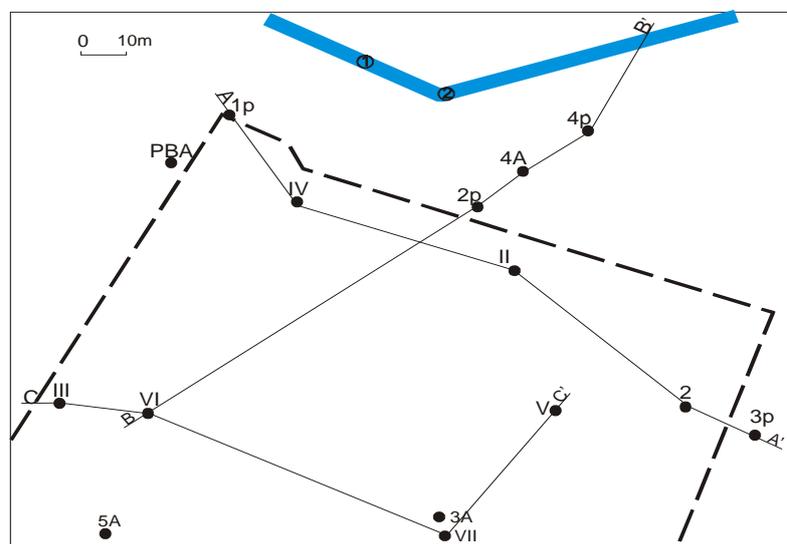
Site plan of waste dump „Chrobów” and lines of geological cross-section.
